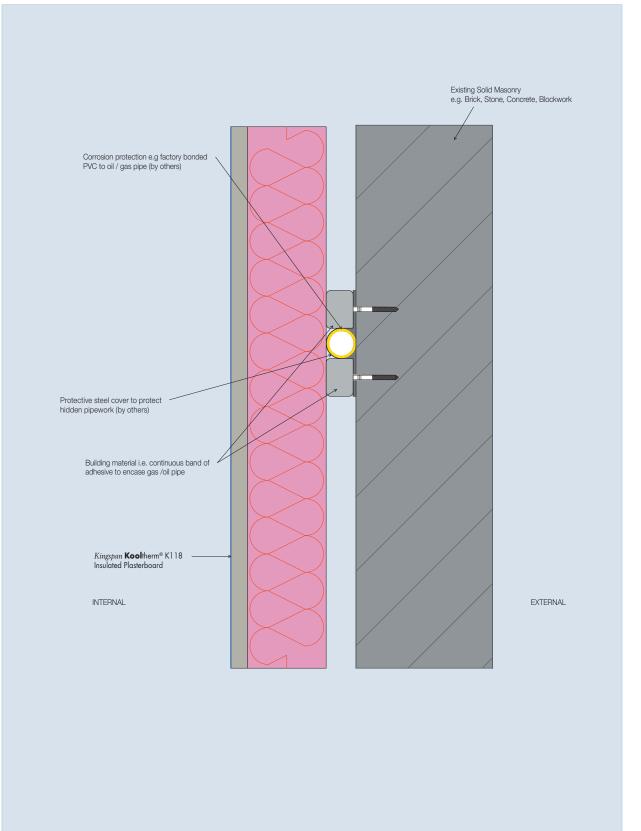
Vertical Gas or Oil Pipe behind Dry Lining Detail (Adhered)
